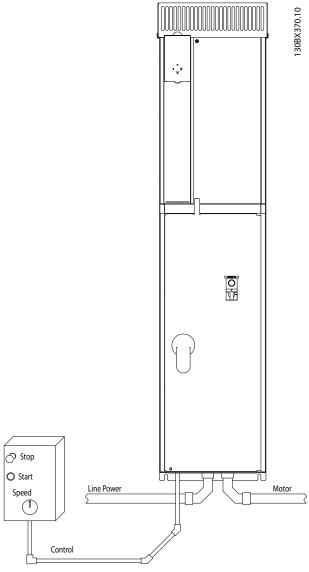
Example of Proper Electrical Installation Using Conduit
